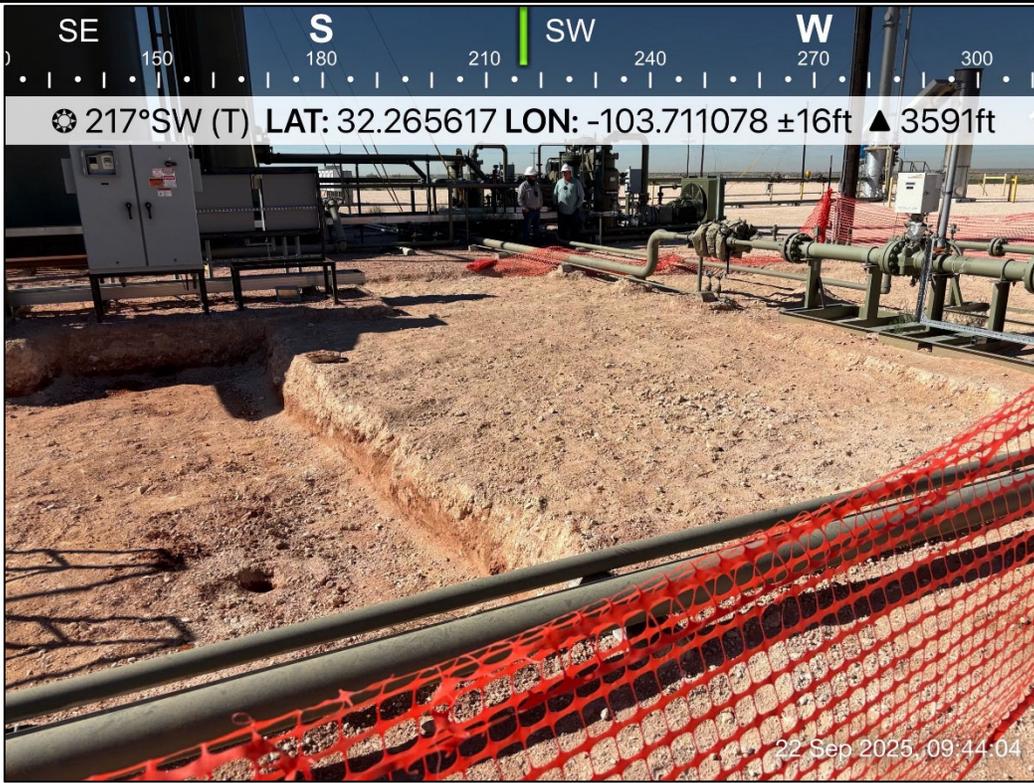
Southwestern view of excavation extent. 9/22/2025
